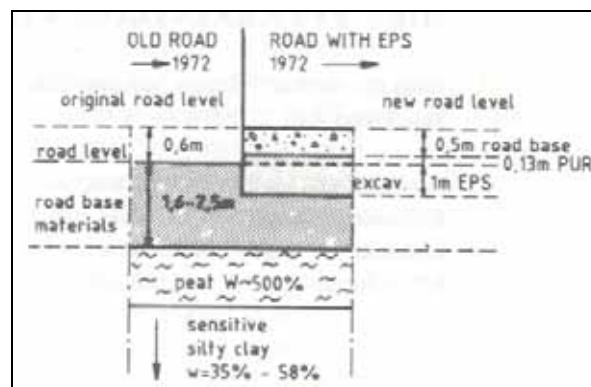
Road No Ev-10 Austerstraumen – Gullesfjordbotn.
